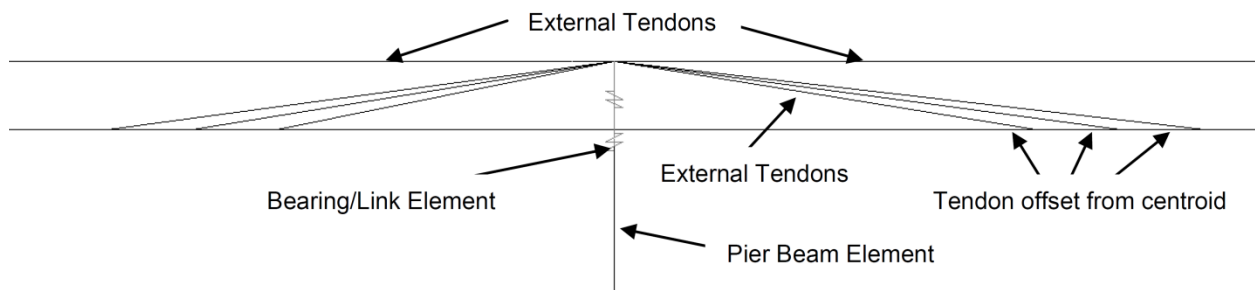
Varina-Enon Beamline External Tendon Modeling Details
